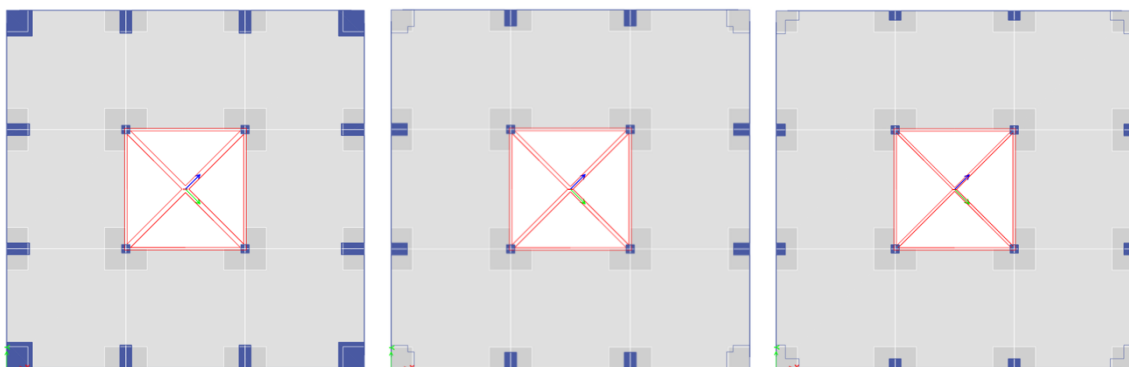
Floor plan of the building model (from the base to 74,9m high on the left; from 74,9m to 160,2m in the middle, from 160,2m to the top on the right)
